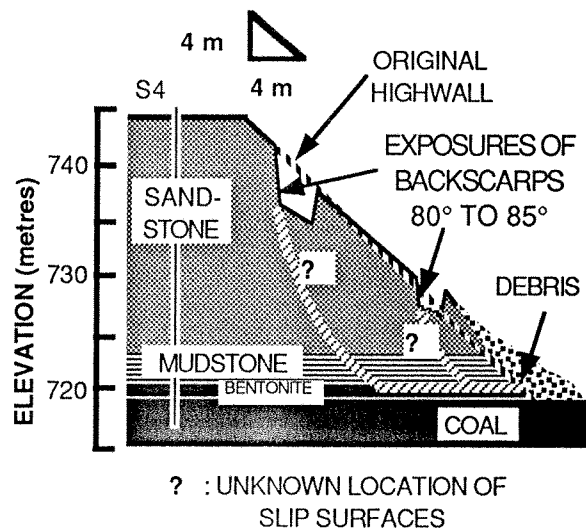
Post failure topography at Section A-A' through west end of failure, as observed on April 7, 1988.
